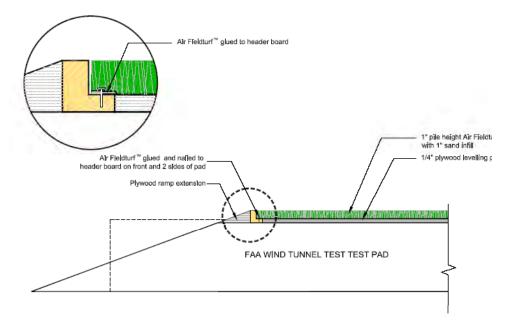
AIR FIELDTURF ENGINEERING DRAWING FROM WIND TUNNEL, 1.0-INCH FIBER
